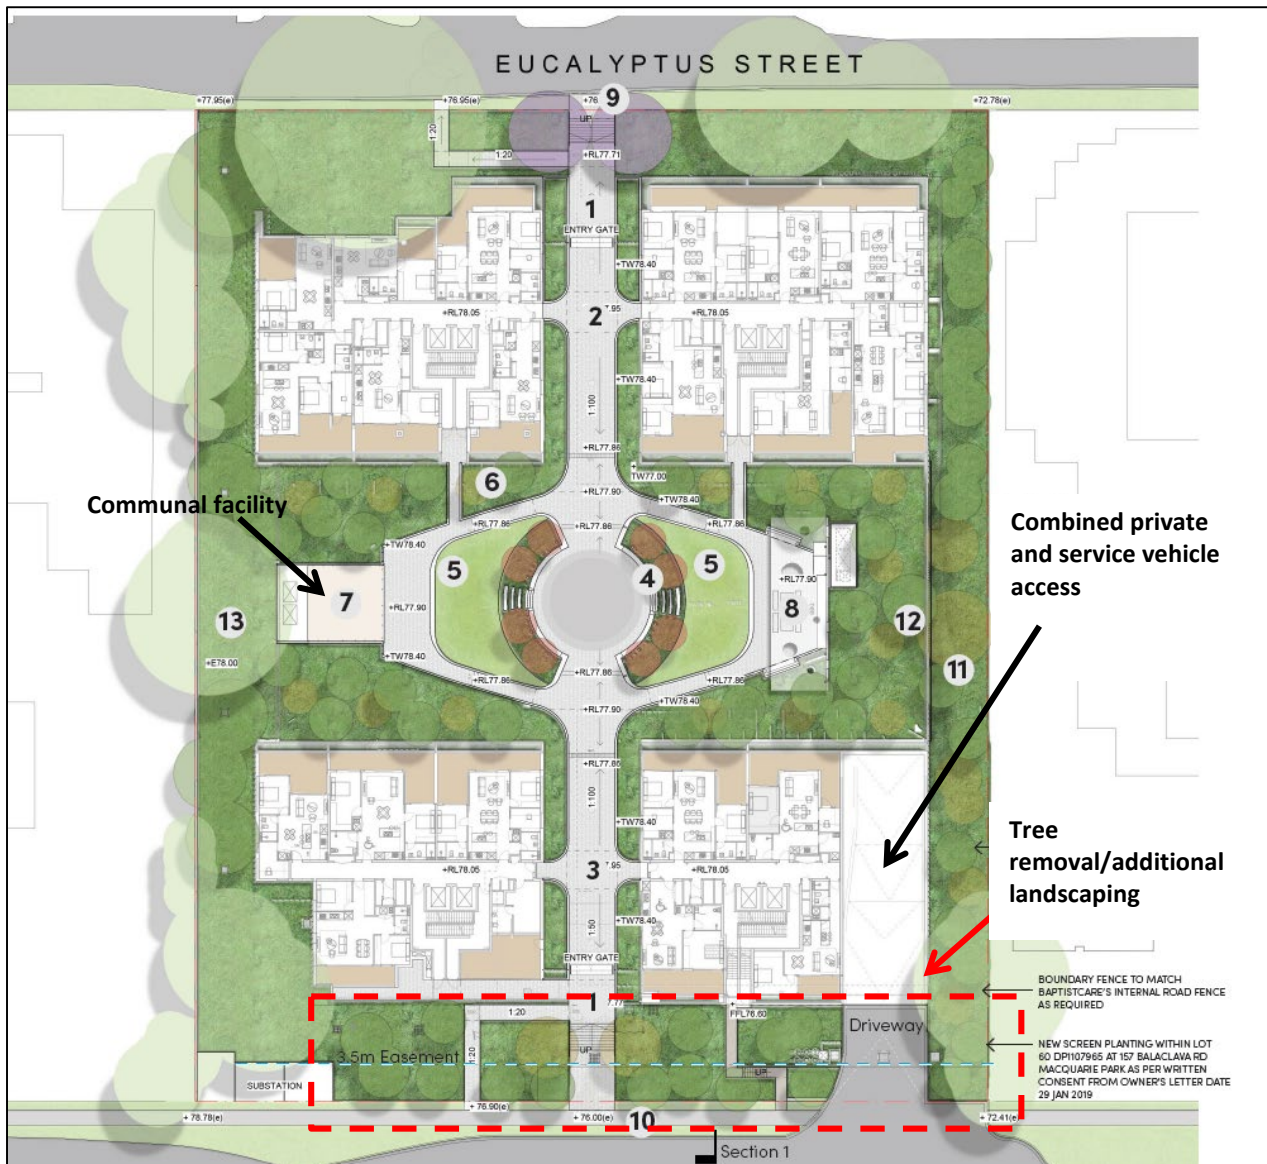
Proposed Level 1 Plan showing amended vehicular access, building entries, communal open space, and communal facilities and landscaping.
